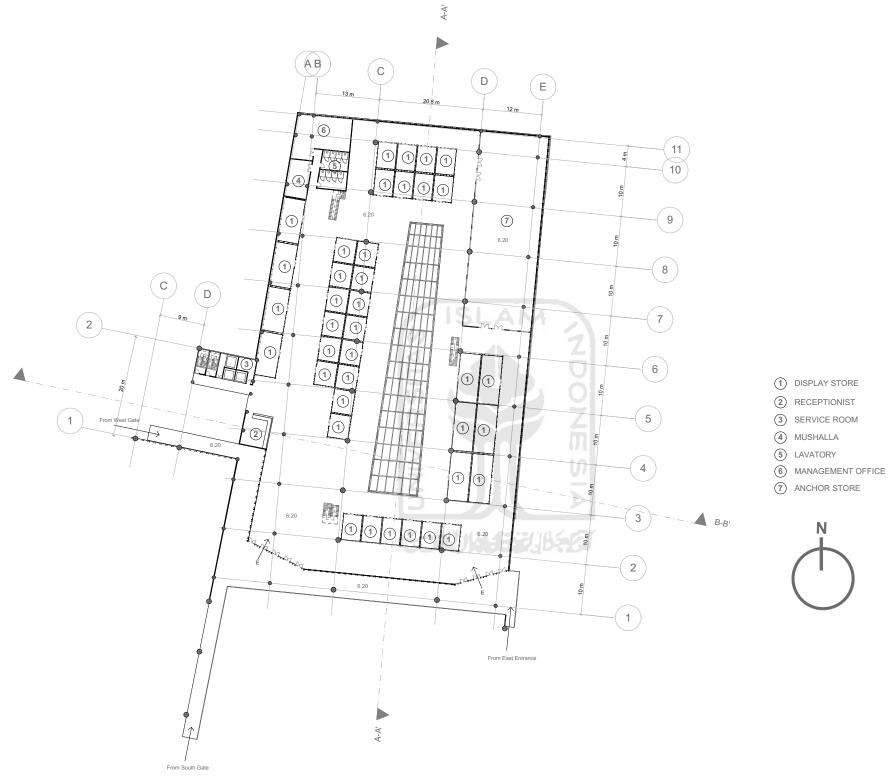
Groundfloor plan of the commercial center Source: Author (2021)
